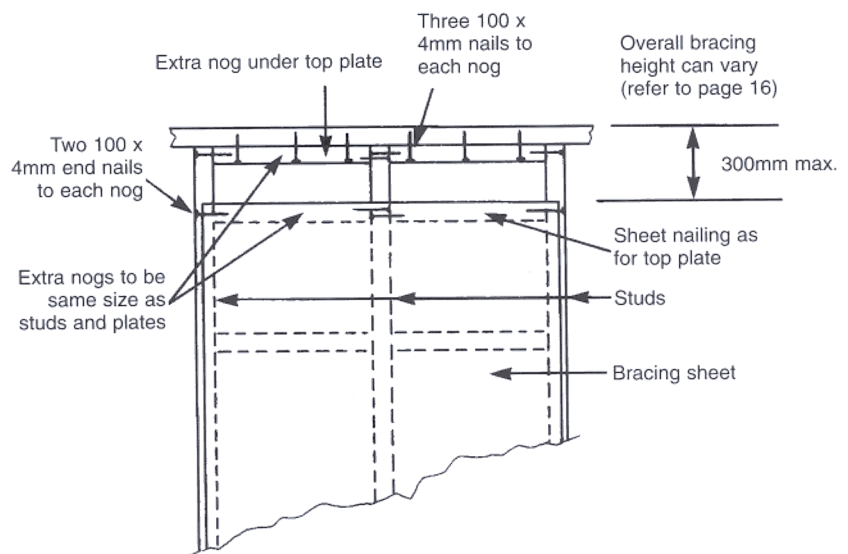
DETAIL WHEN BRACING SHEET STOPPED BELOW TOP PLATE
